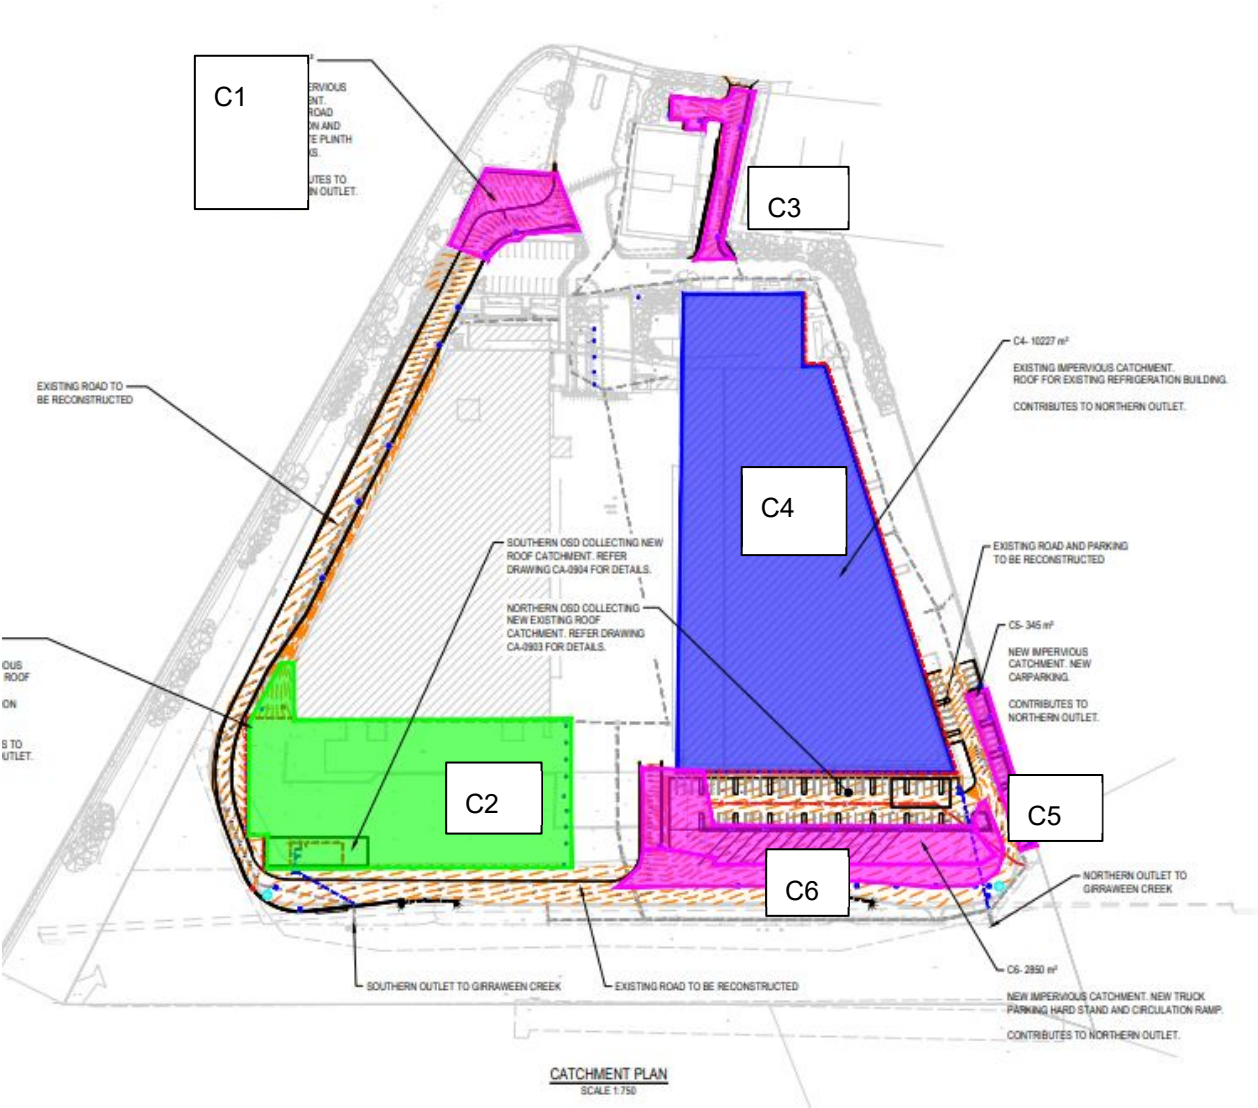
Snip from Catchment Drawing 2527456-CA-901
